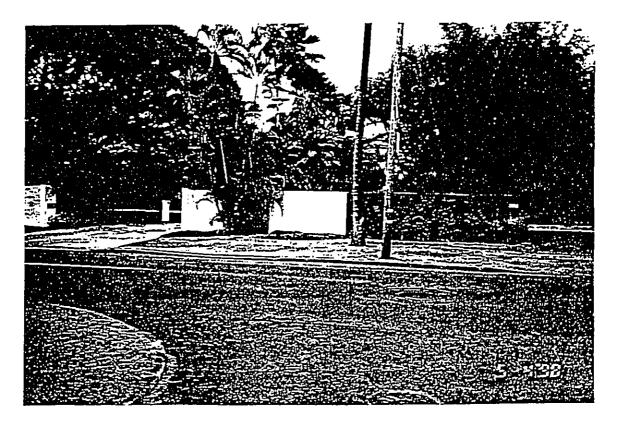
Intersection at Ulili Street & Kahala Avenue
